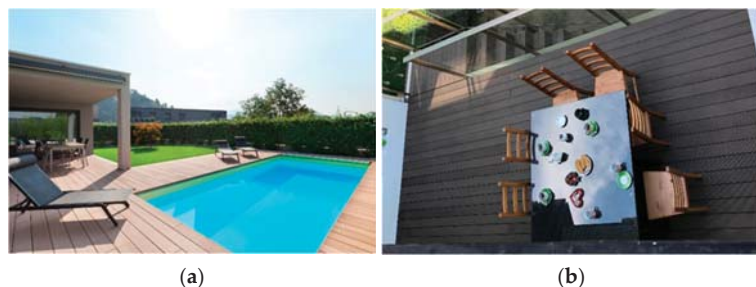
Sample application of NFPC profiles in civil engineering for outdoor floors: (a) at a swimming pool, (b) on the terrace.
